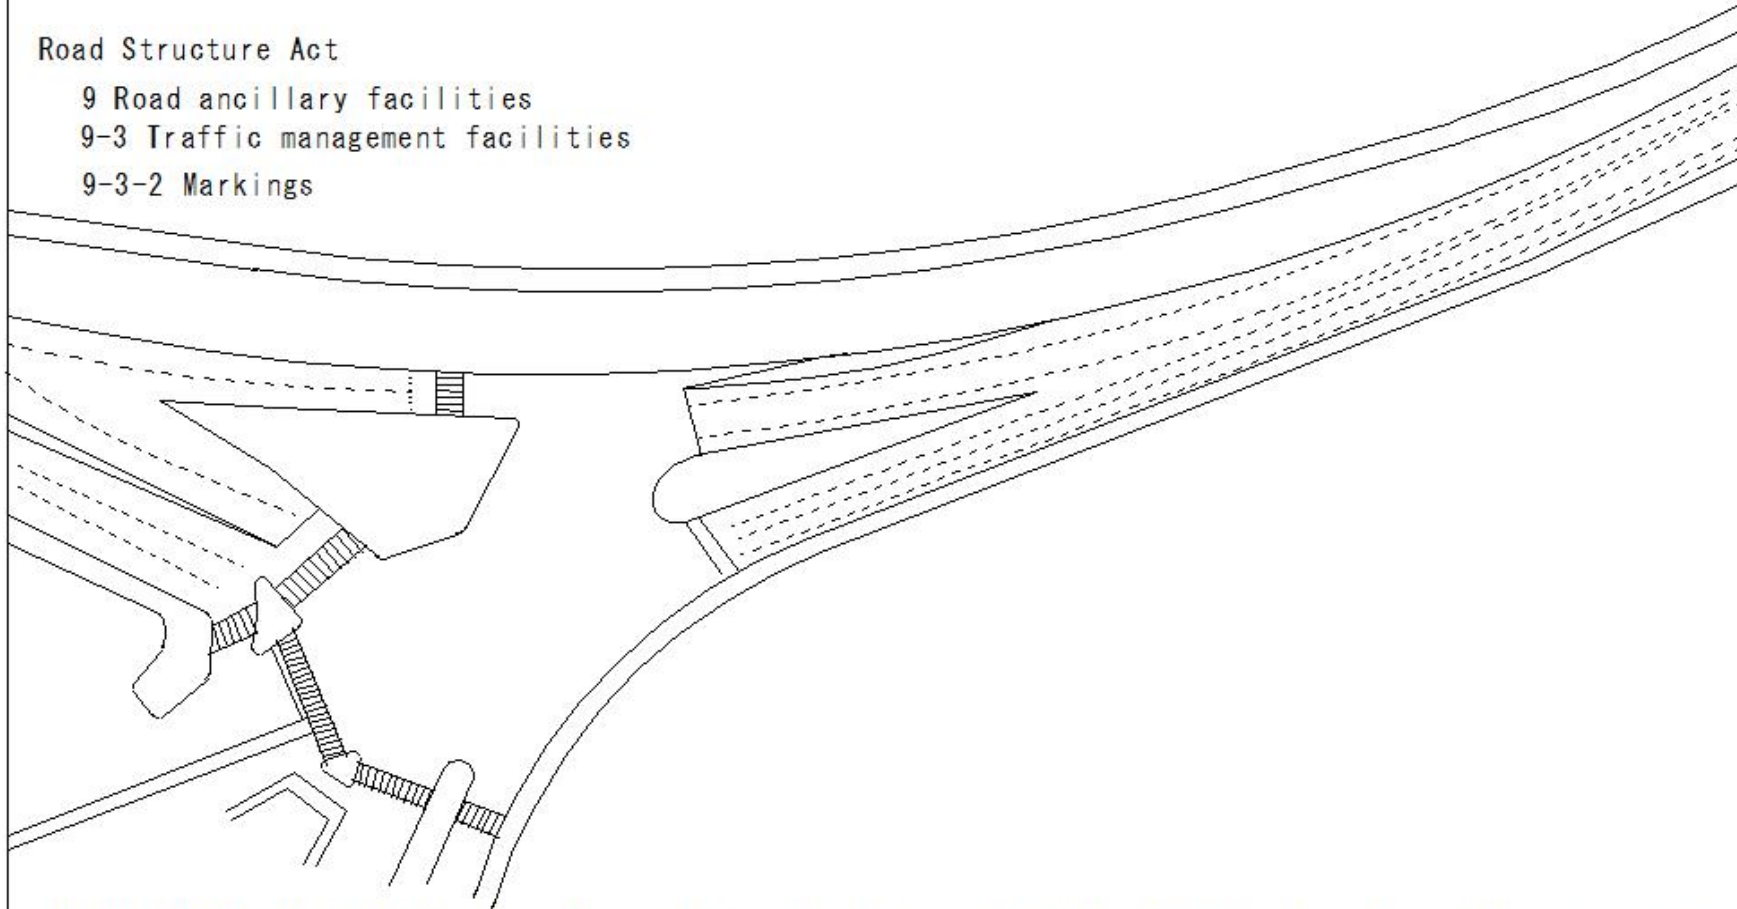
Style, dimensions and installation examples of diversion markings <Installation examples>
